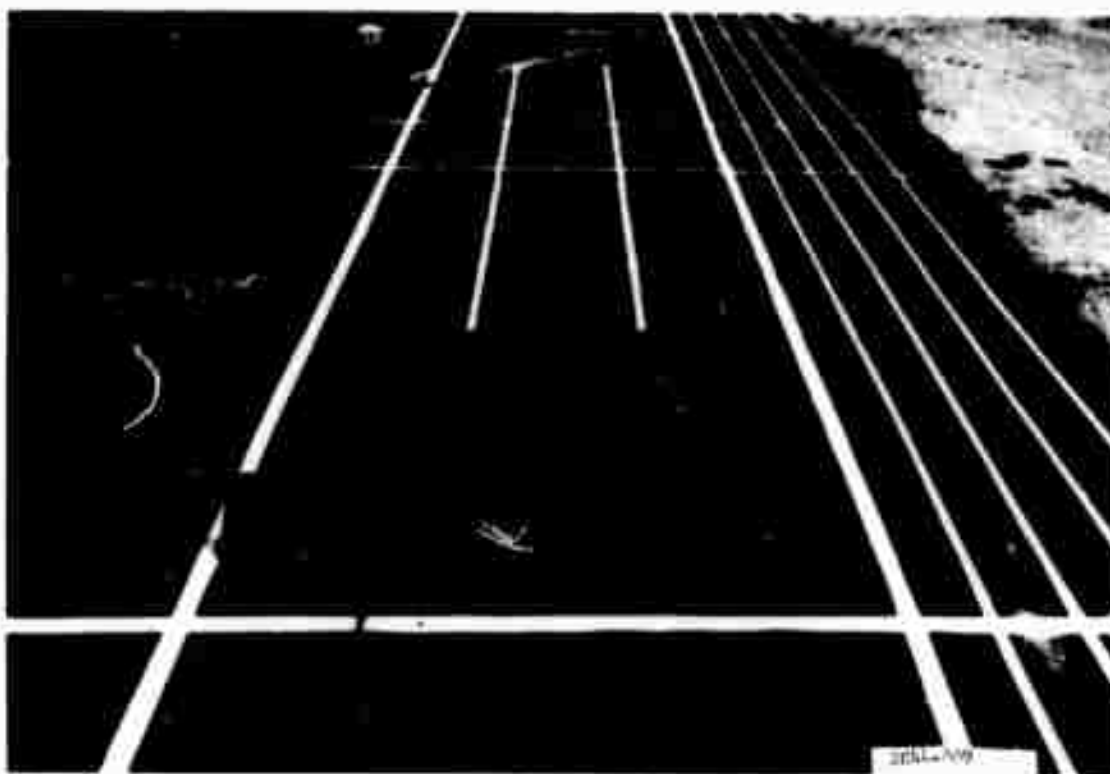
Item 2, lane 1, flexible pavement test section, prior to traffic
